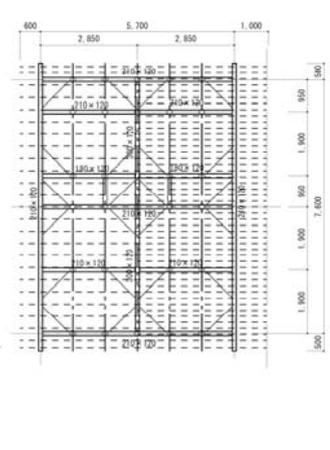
Elevation plan of anew two-story wooden house, O-house (Unit: mm)
